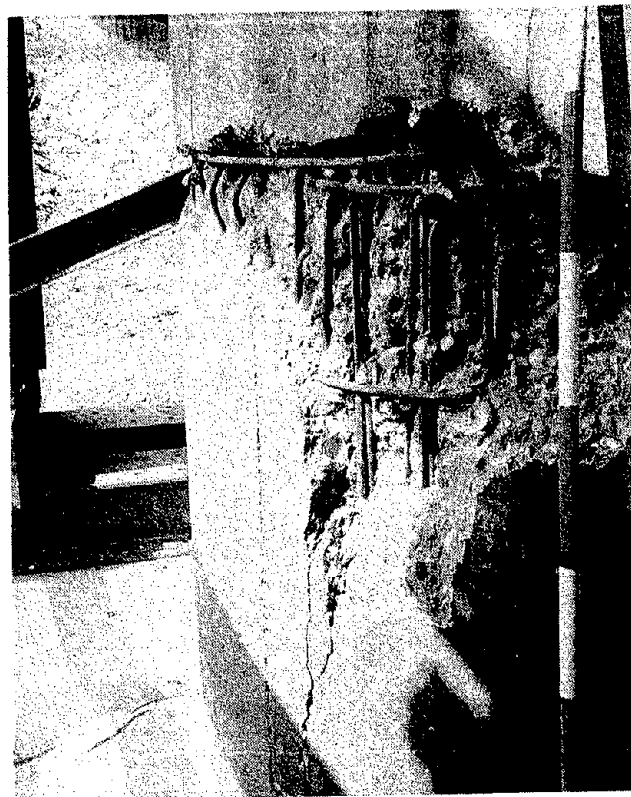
Damage of Motouriya Bridge at Splicing Zone
